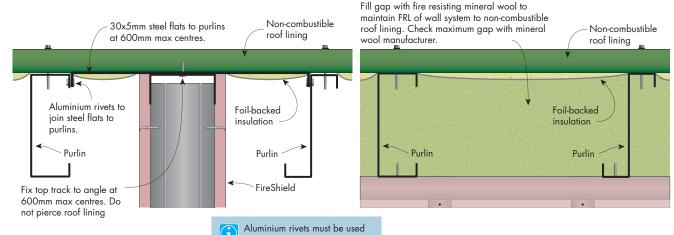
Wall Head to Roof Wall to parallel purlins
